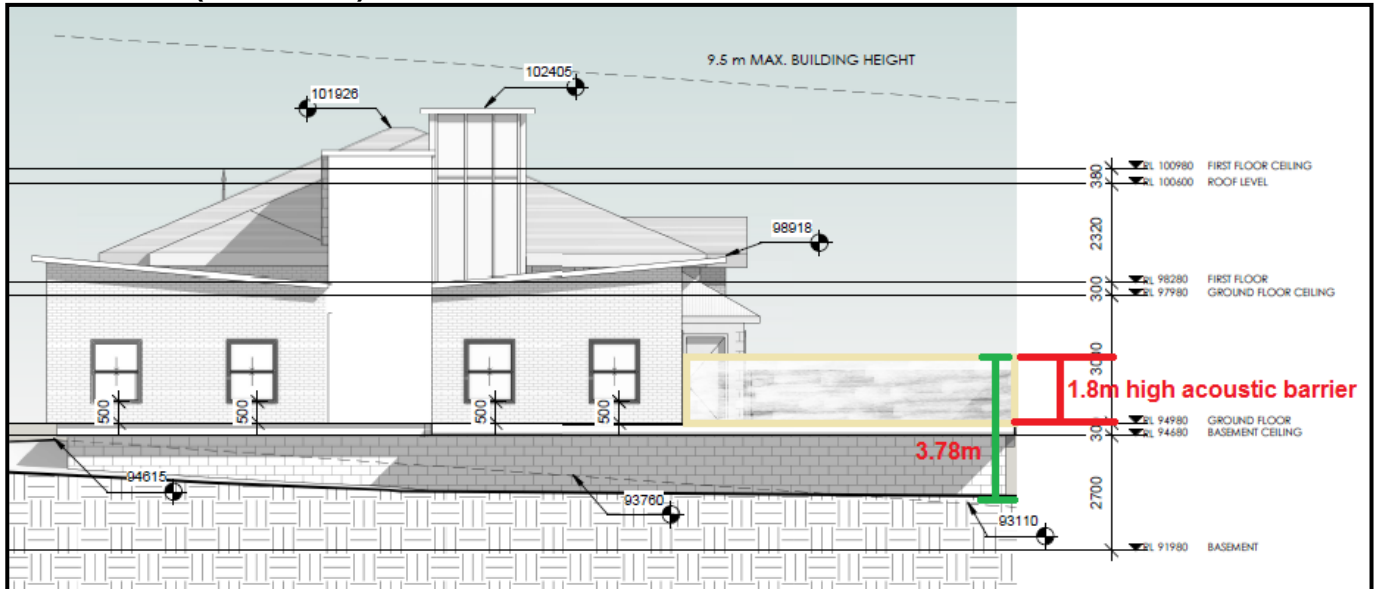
Overall height of basement wall and acoustic fence above, as viewed from the rear.
